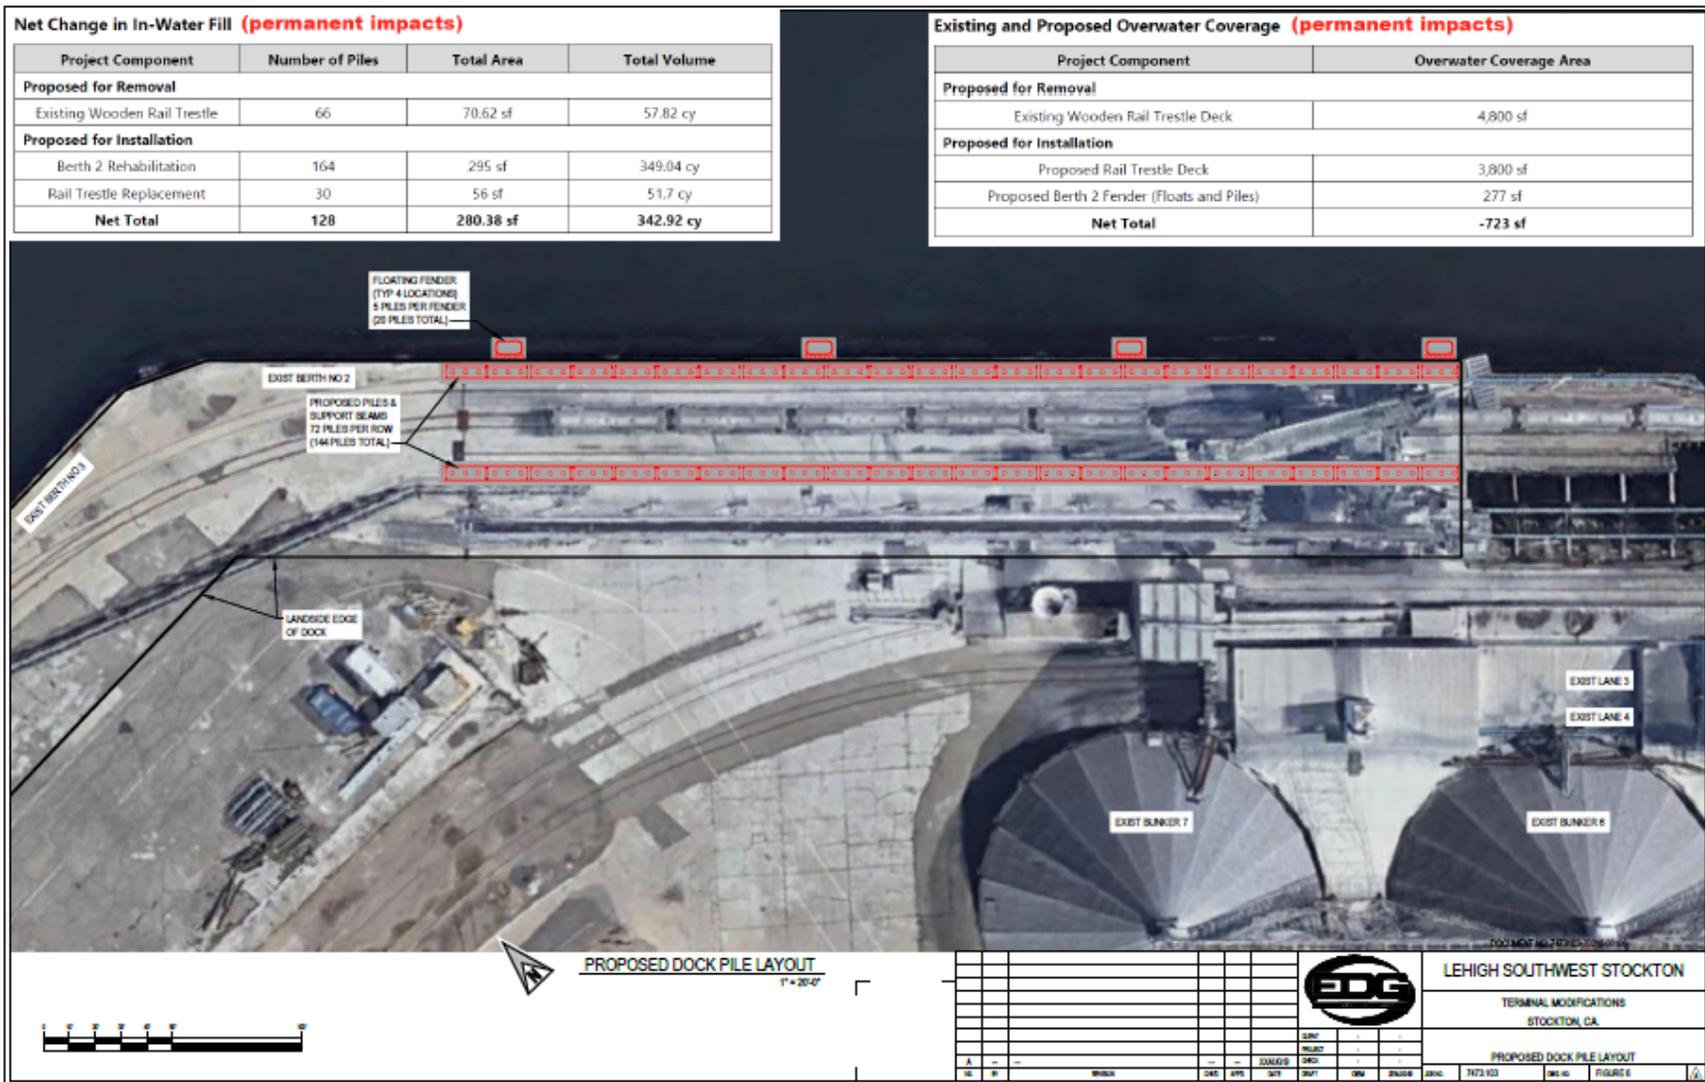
Plan view of proposed new dock piling layout for ship unloader gantry and floating fender system (Anchor QEA 2019).
